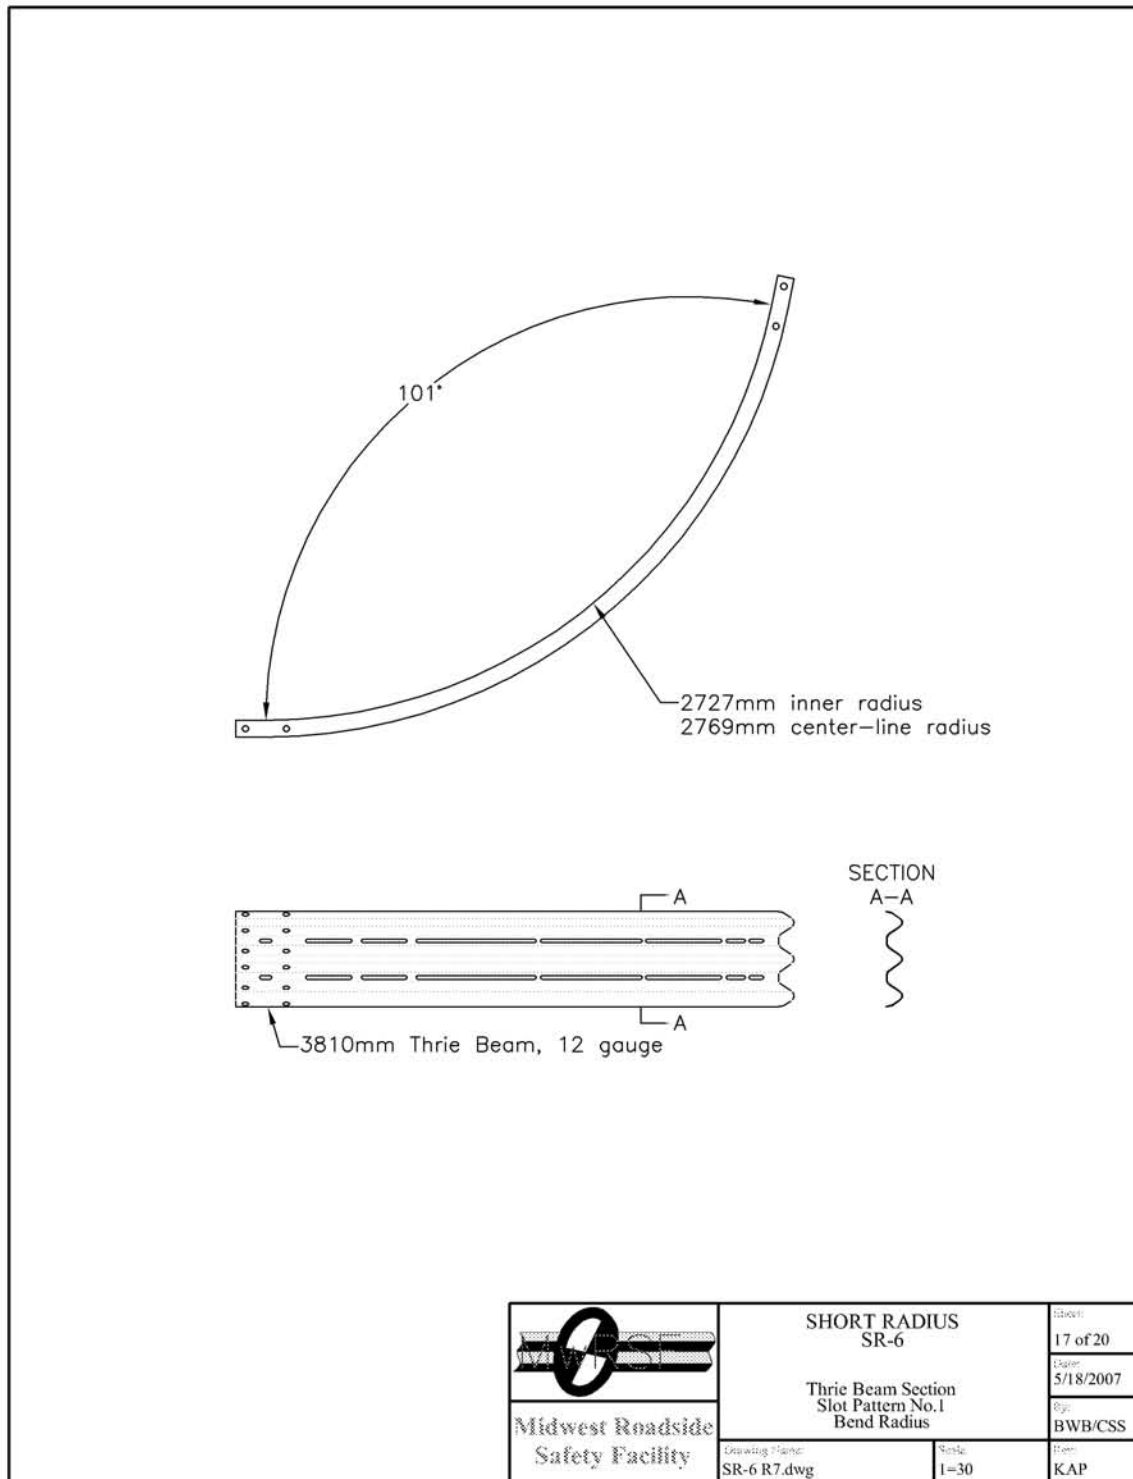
Rail Curvature, Rail Section No. 1, Test SR-6
